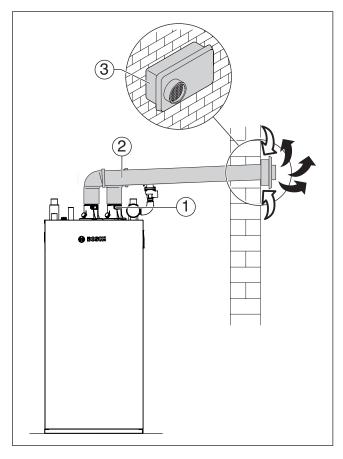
Horizontal venting system (sealed combustion); 3 is a wall termination
